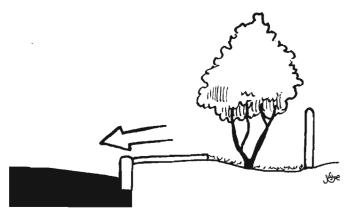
A. Sidewalk wastefully sloped to drain its runoff to the street. Note: Sidewalk slope is exaggerated.
